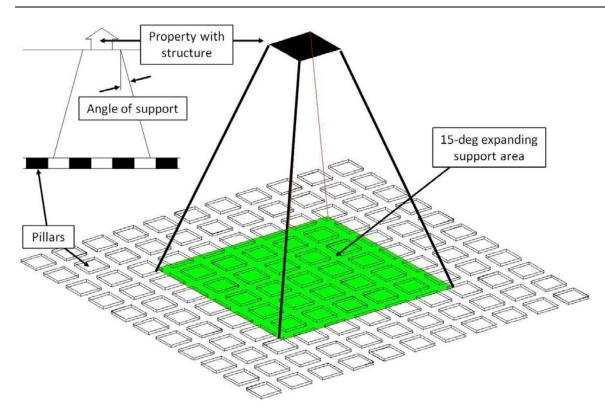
An interpretation of pillar support required by the BMSLCA (1966) to protect structures from subsidence damage (from Iannacchione et al. 2011).
